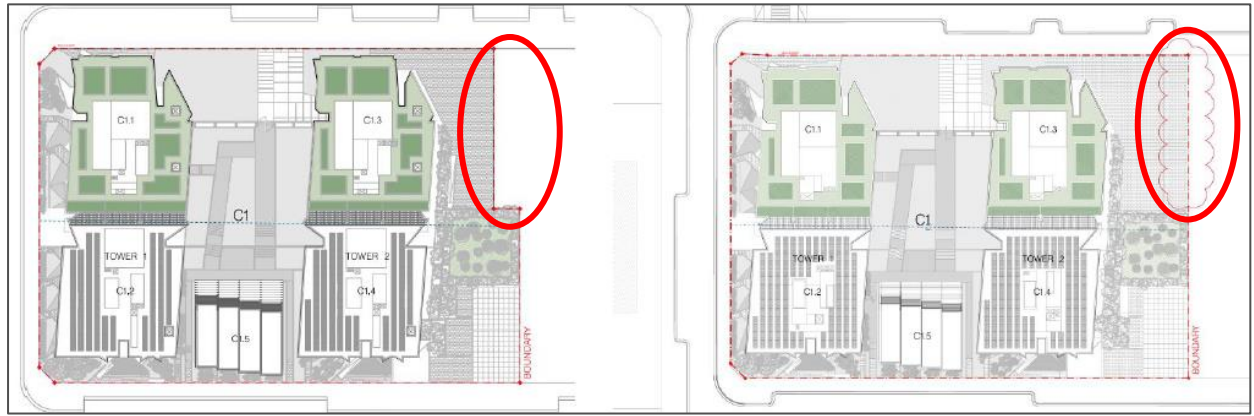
| Approved site plan (left) and proposed site plan (right). Location of change shown circled red (Source: Applicant's SEE)
